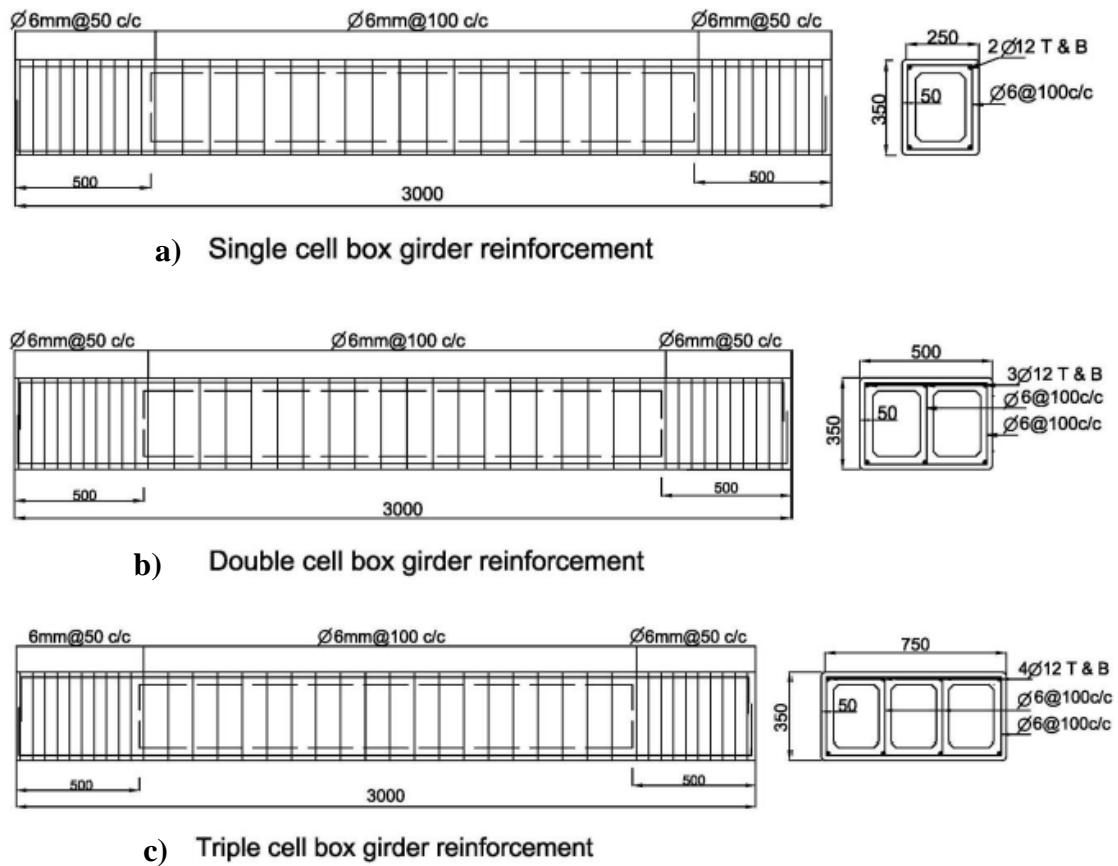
Geometrical detail and reinforcement of girder specimens: a) Single cell box, b) Double cell box, c) Triple cell box
